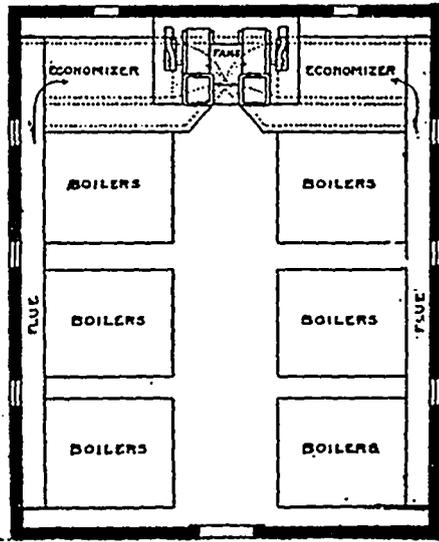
2400 H.P., BOILER PLANT EQUIPPED WITH MECHANICAL DRAFT.
